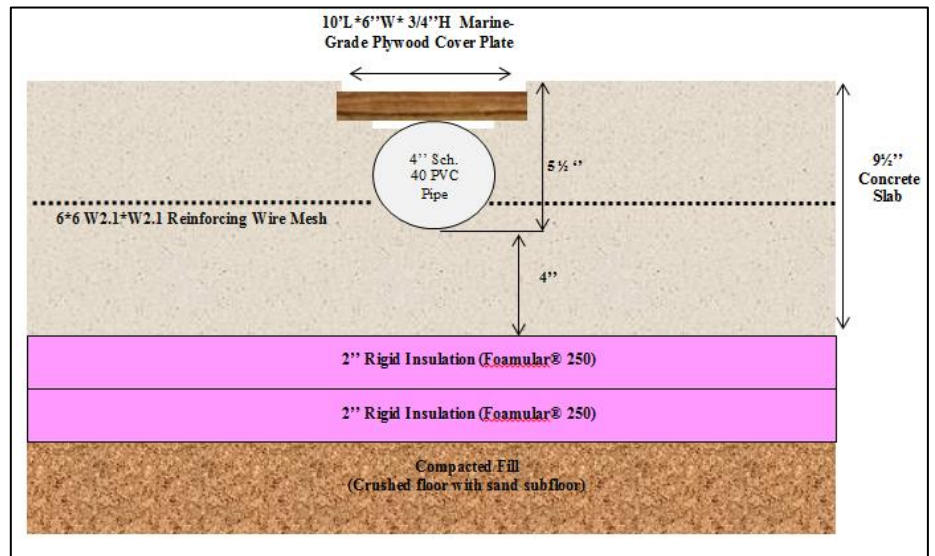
Profile of the UNH Aeration Floor and Subfloor
